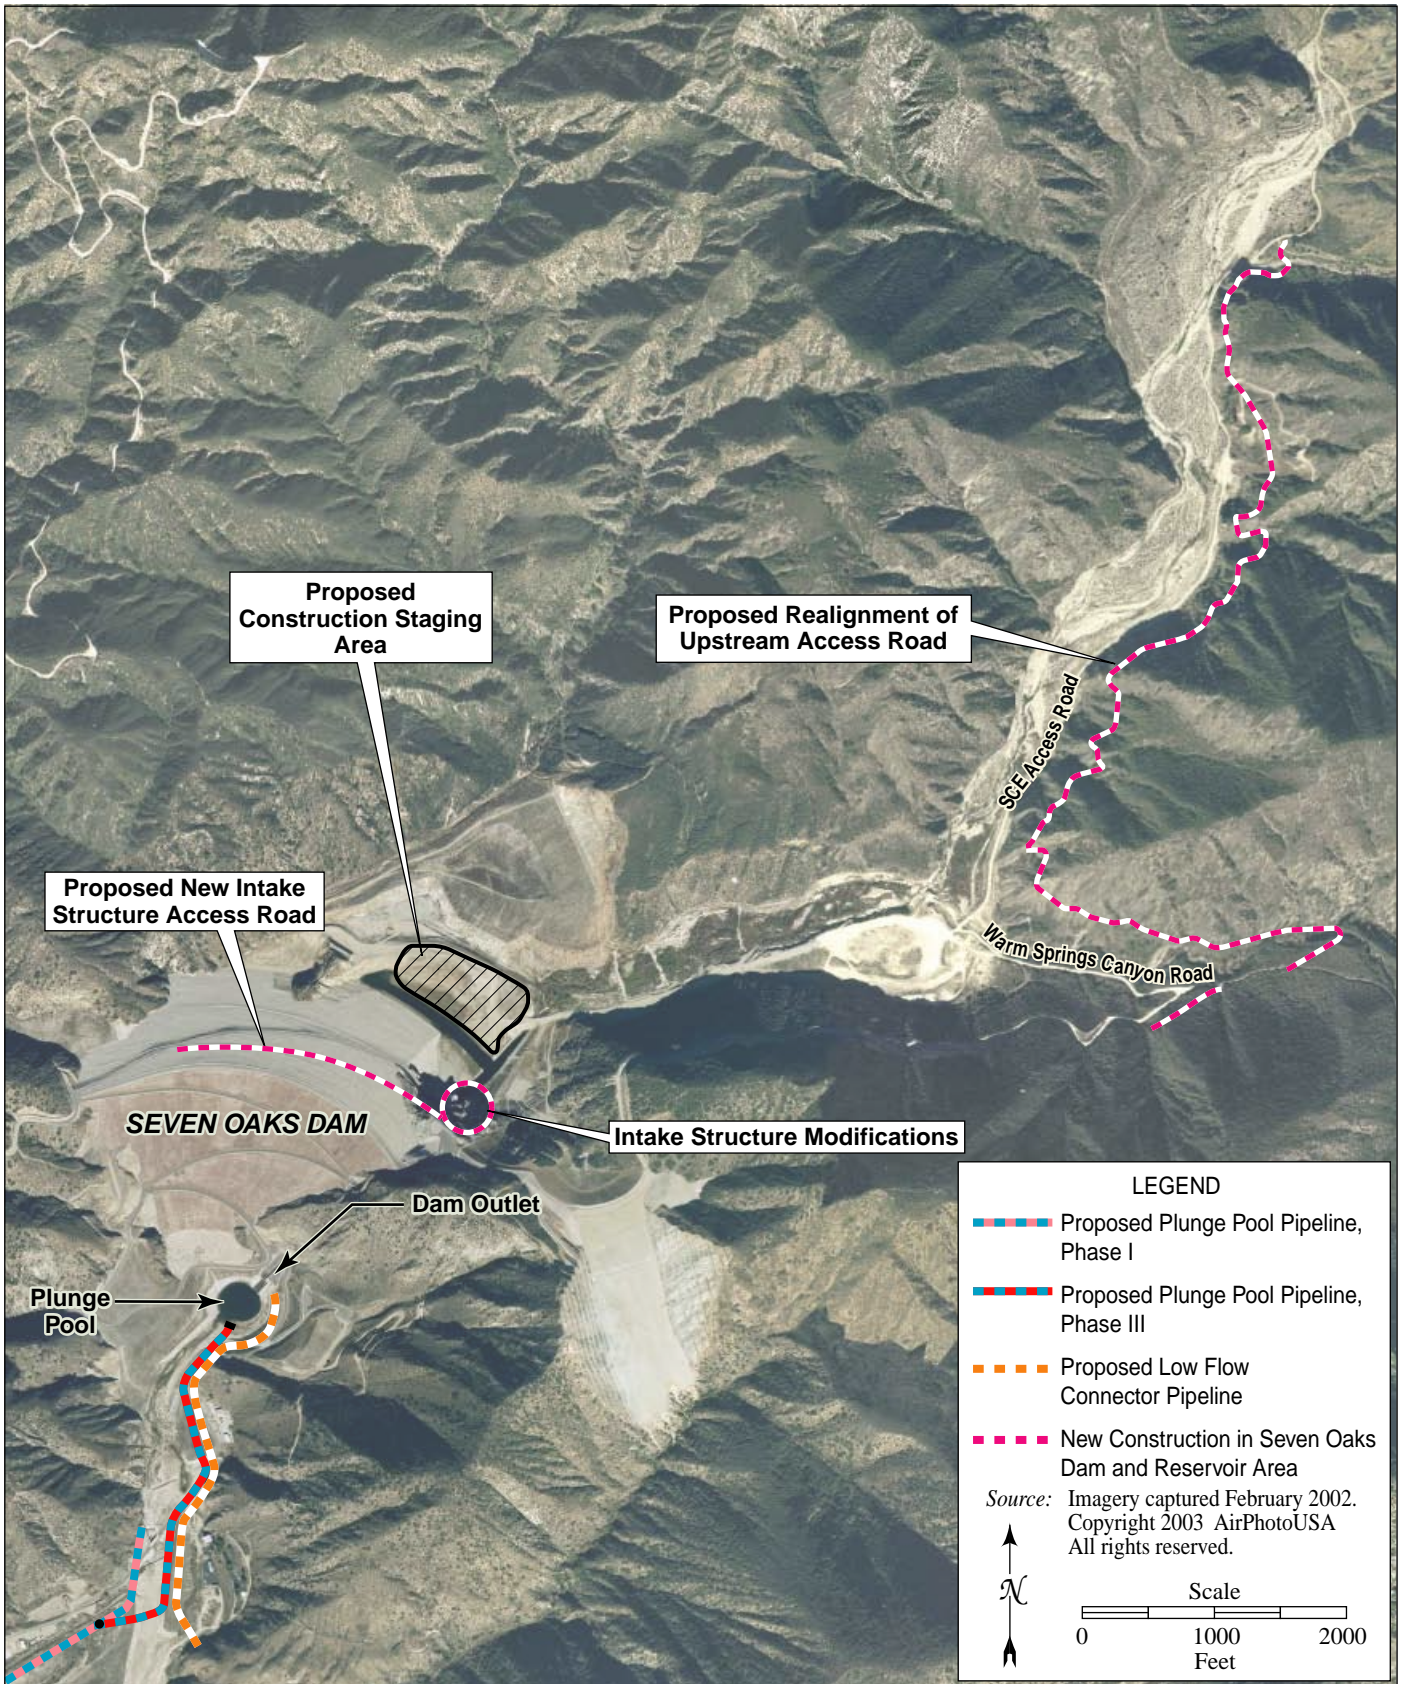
Seven Oaks Dam and Reservoir Construction Area
